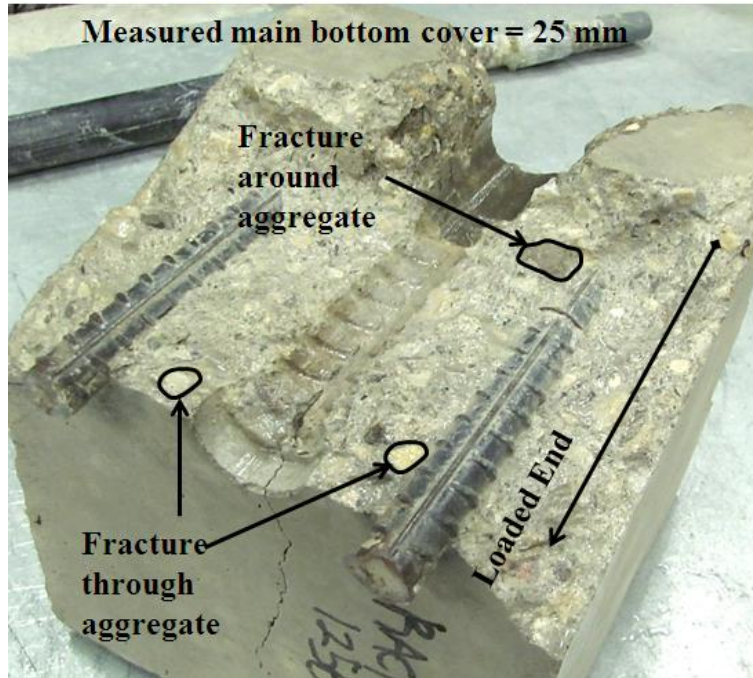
Main failure planes through concrete cover (dissected BE-RAC1-40-125B)
